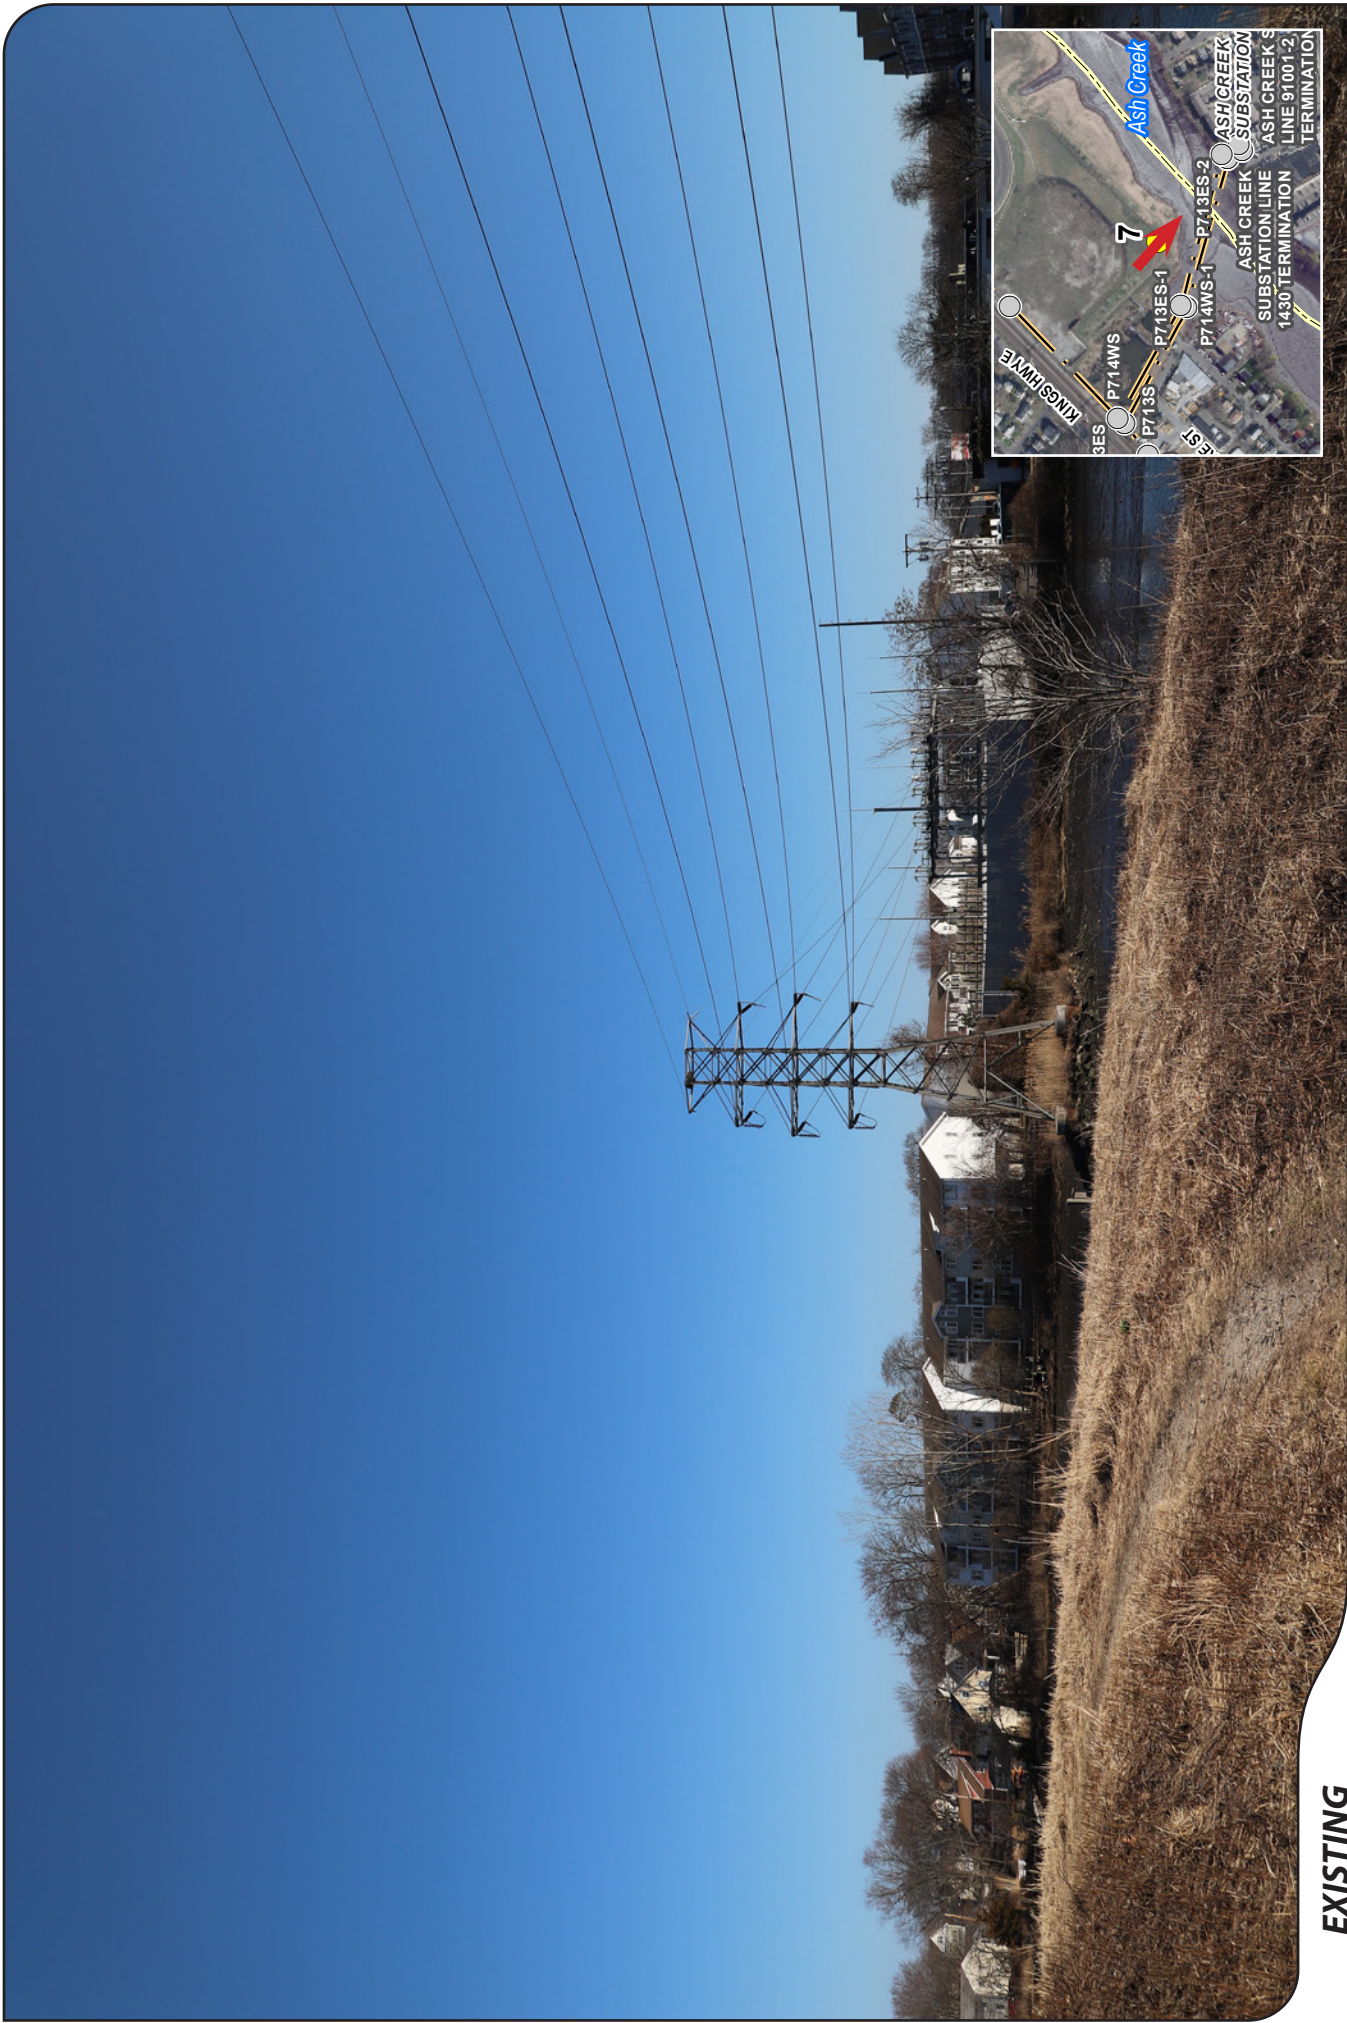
PHOTO LOG, FAIRFIELD AND BRIDGEPORT (PHOTOS 7-10)
